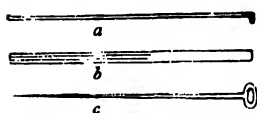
a*, Scraper. *b*, Stemmer. *c*, Pricker used in Blasting
